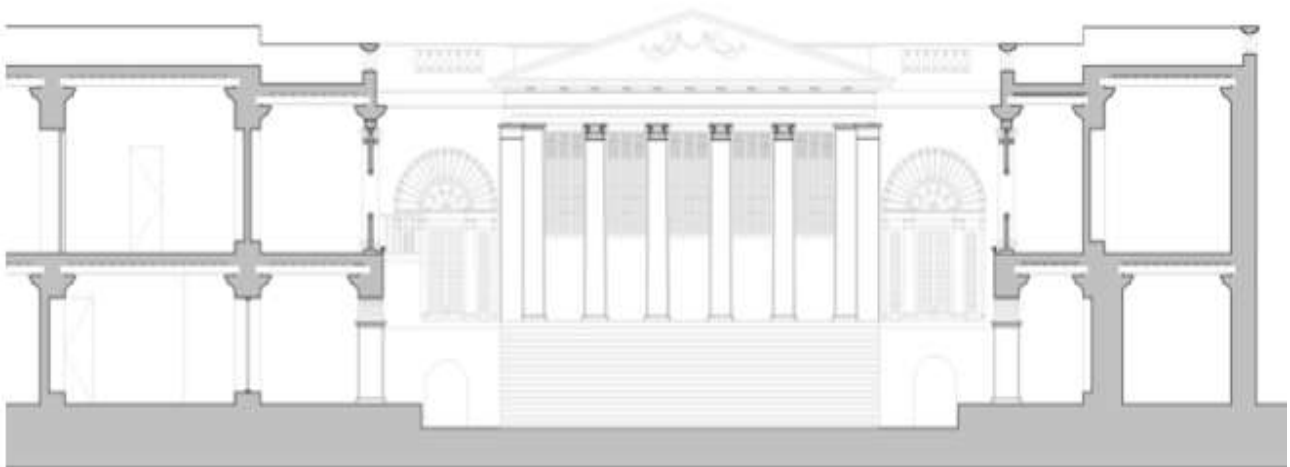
Sectional Elevation of the Rajbari facing North, showing the Doric columns of the Puja Mandap
